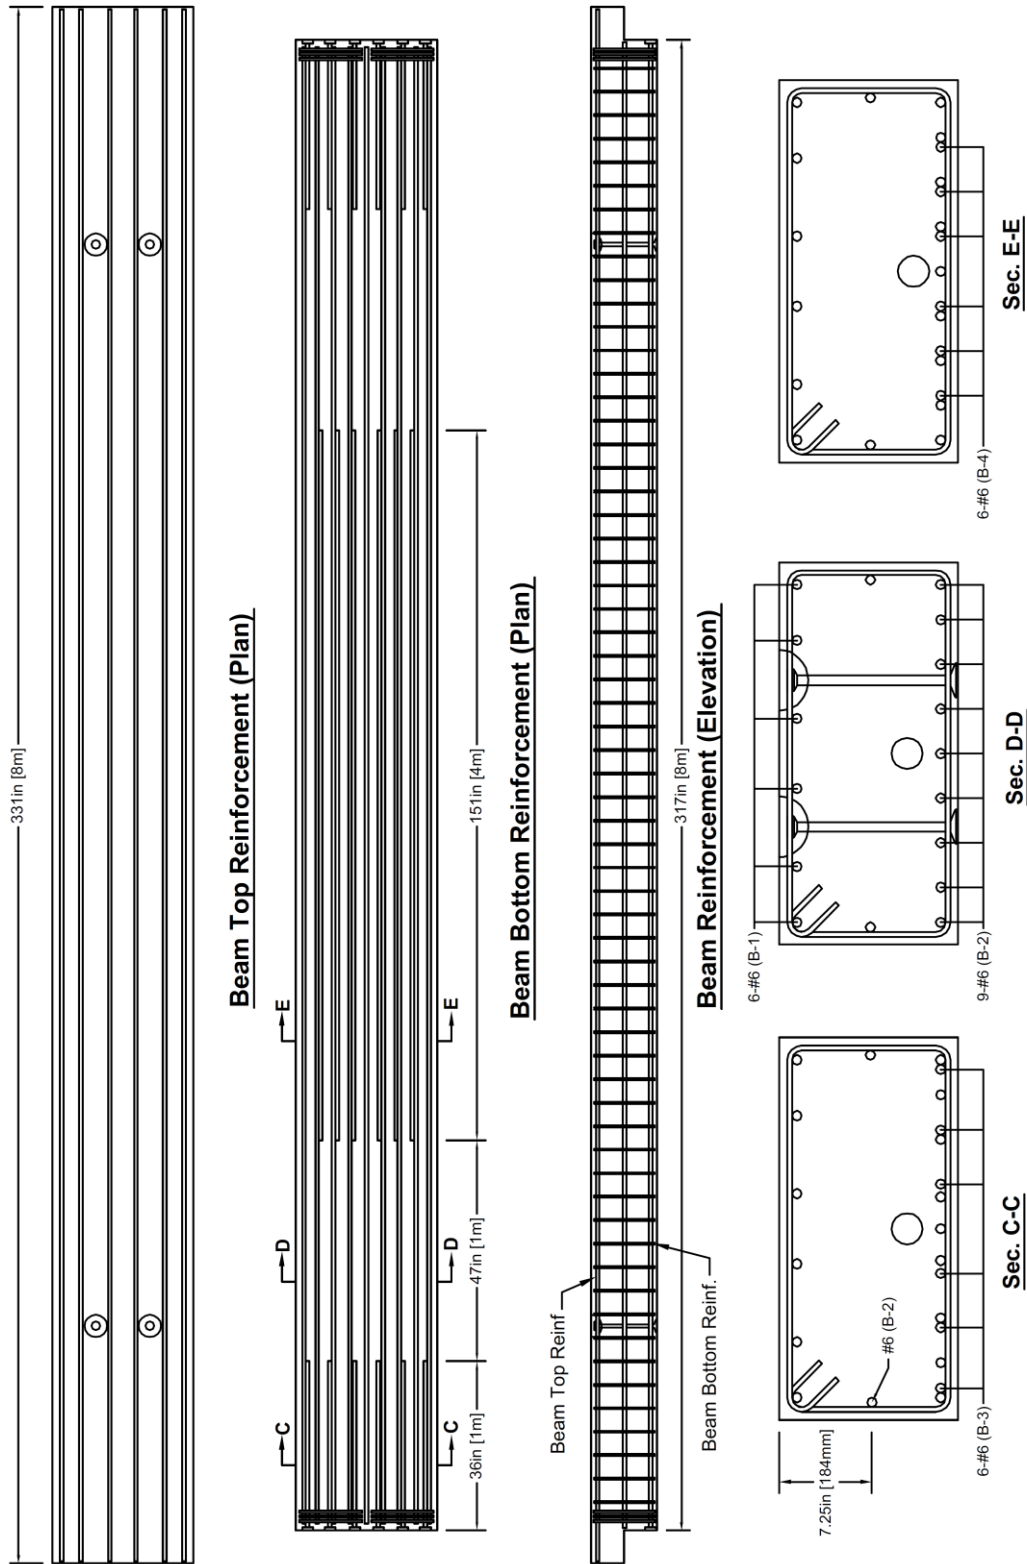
Superstructure plank reinforcement (from Johnson 2006)
